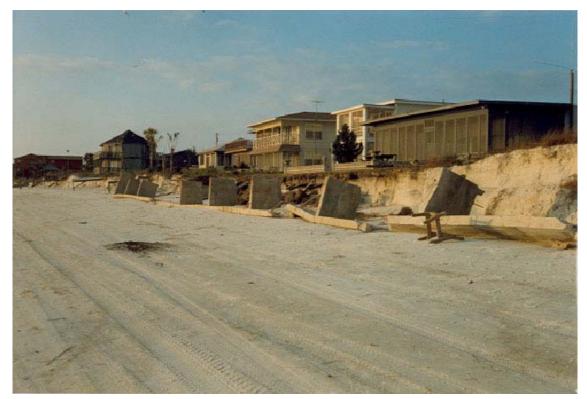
Concrete wall destroyed, Mexico Beach (Brett D. Moore).
